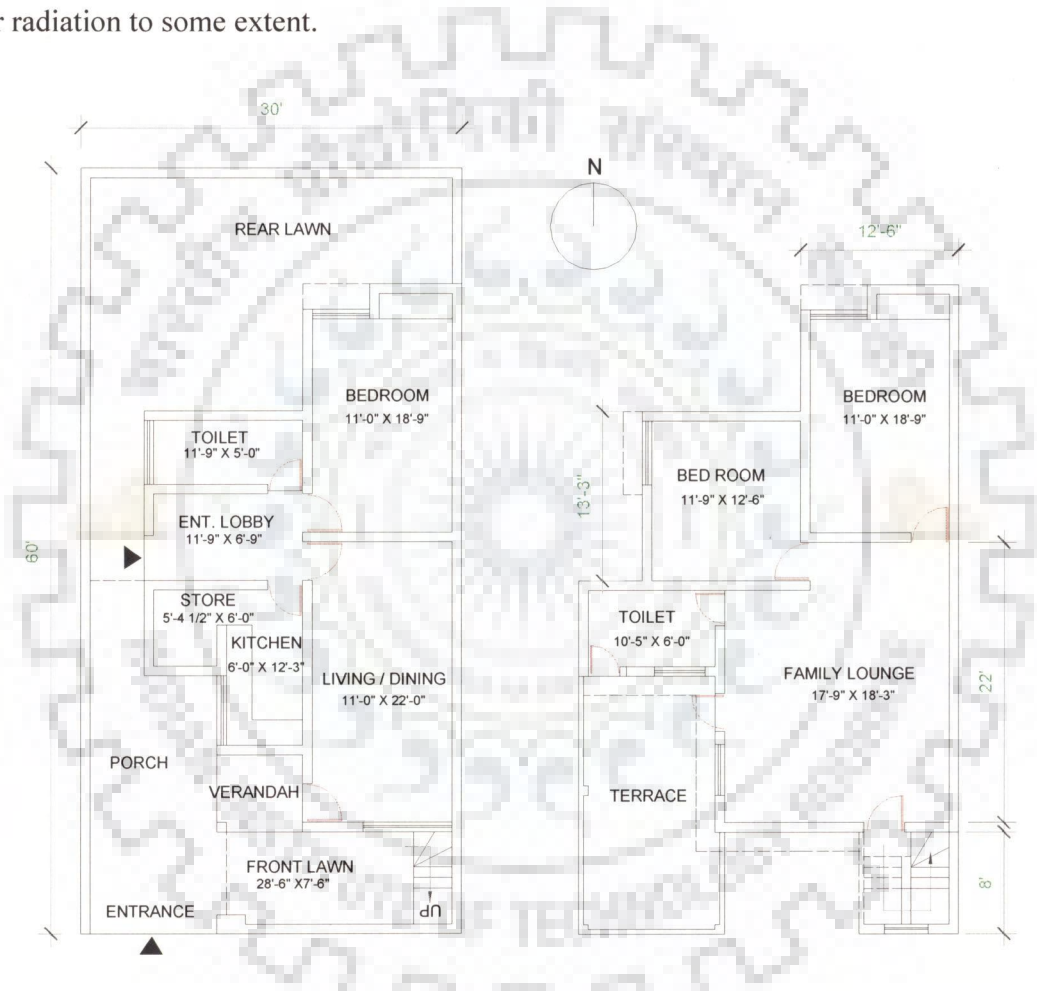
Ground and First Floor Plan of L.D.A. House II.
